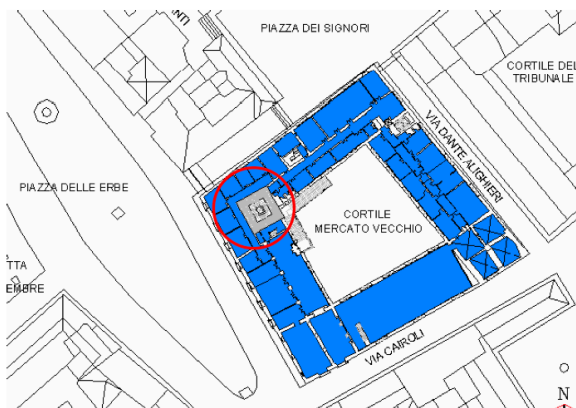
Map of the Lamberti Tower, where is possible to see adjacent buildings.
